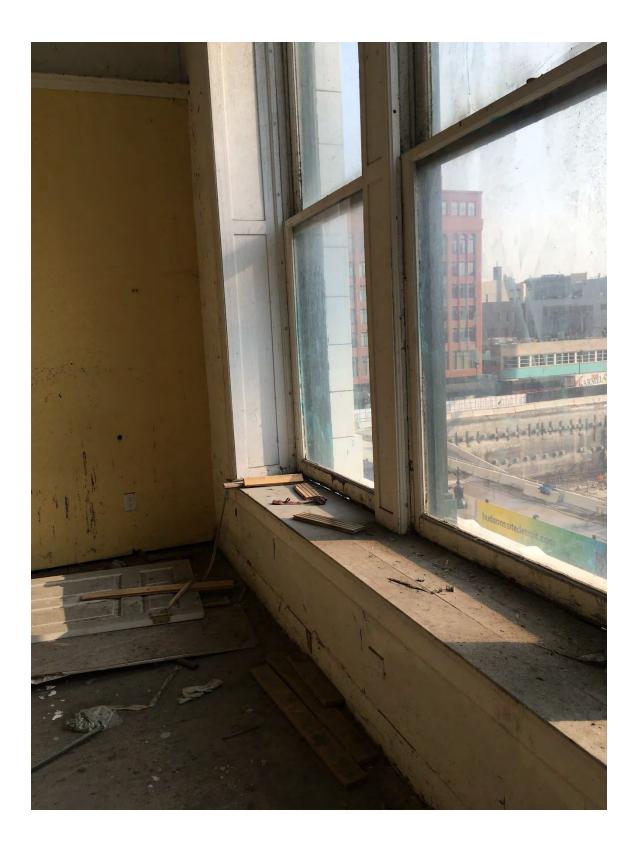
Interior, 3rd floor, Window Detail, Looking Northeast. 5/31/19
